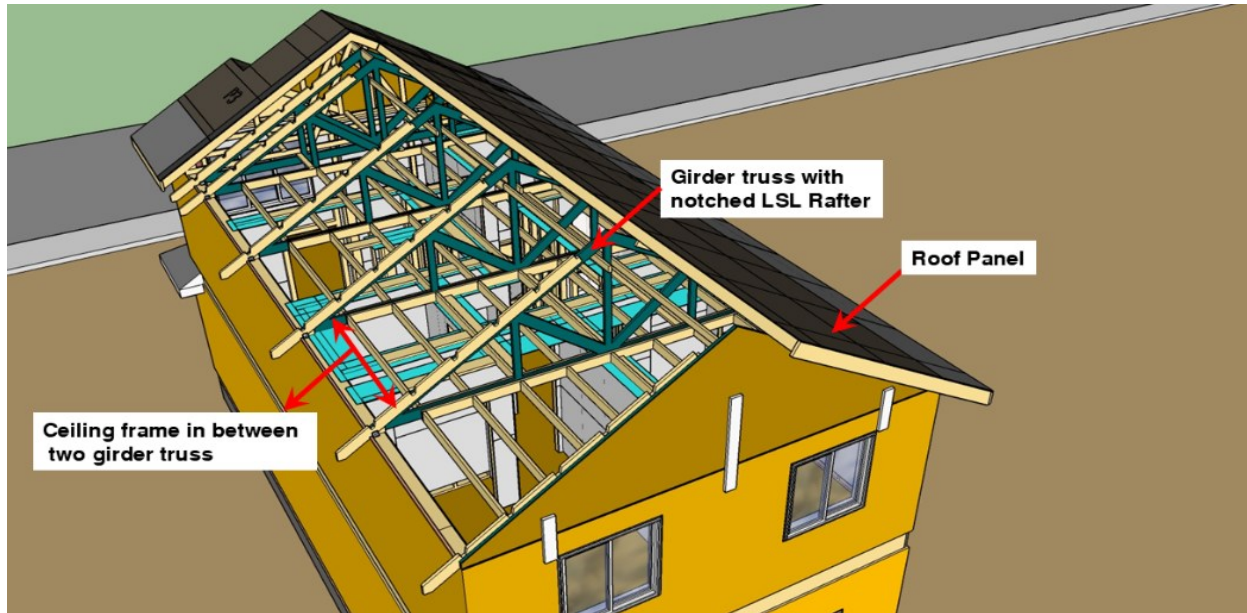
Panelized roof design with howe type girder truss and ceiling frame (Altaf et al. 2018b).
